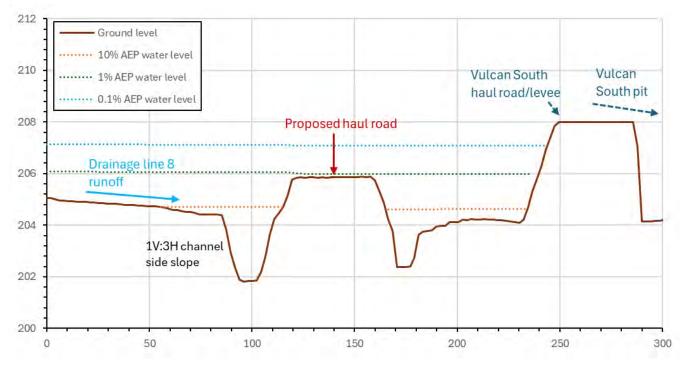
Typical Drainage Line 6 Diversion Cross Section
